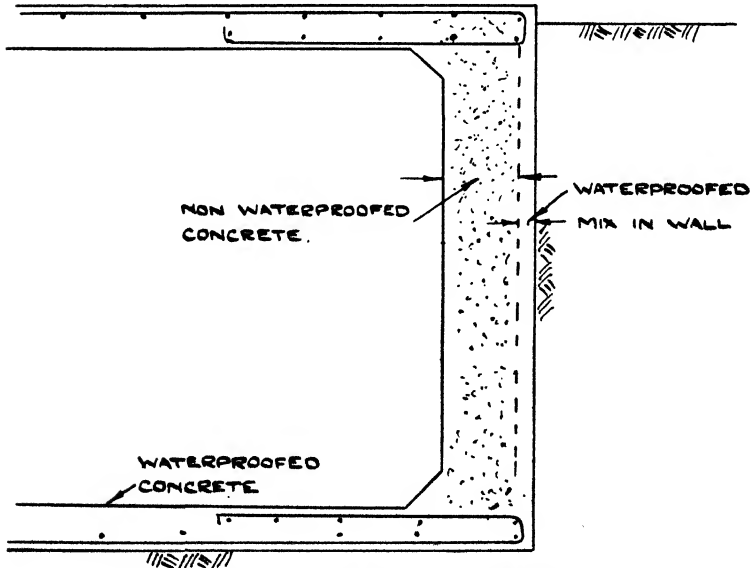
WATERPROOF BASEMENT WITH MASS WALLS
